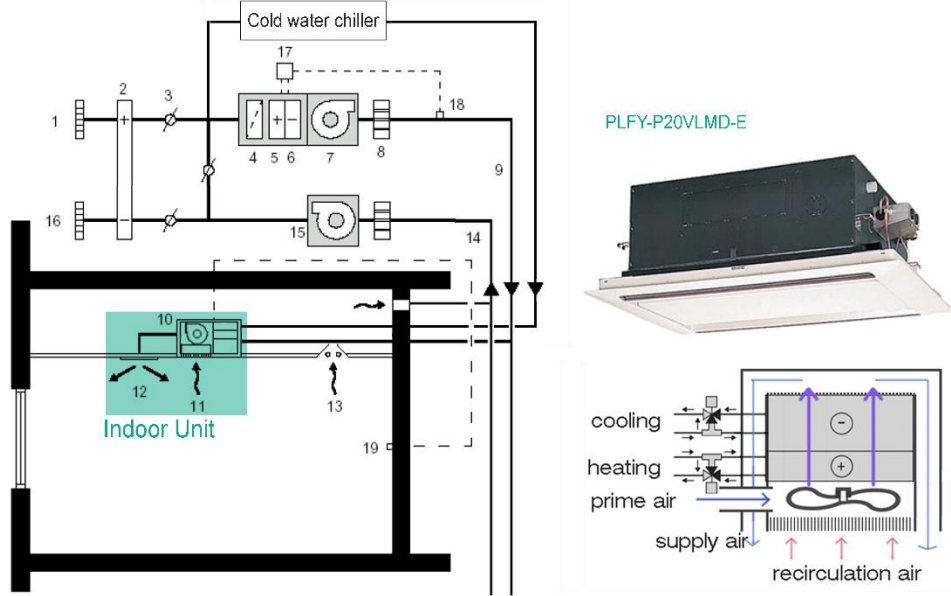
Detail of indoor units from VRF ventilation system (by author).
